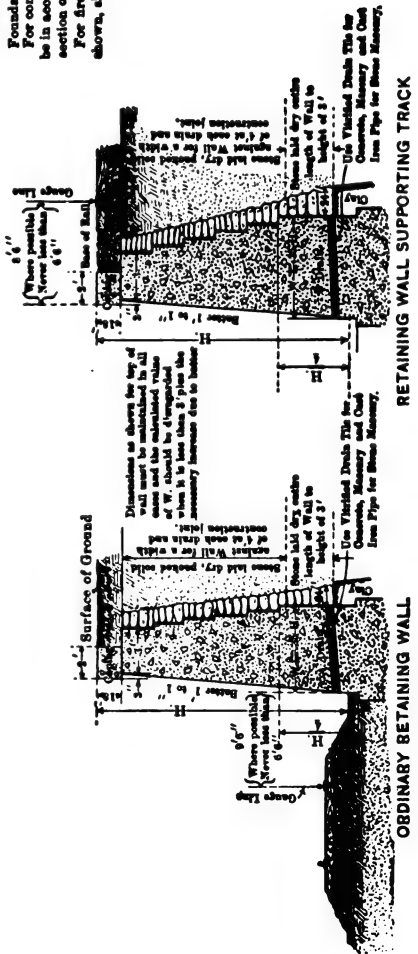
RETAINING WALLS, P. R. R. STANDARD.
